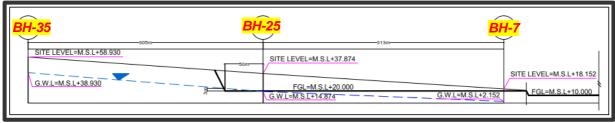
Cross-section of the site with potential groundwater level (Selensu, 2020)
